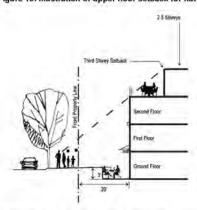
Illustration of upper floor setback for flat or shallow pitched roofs
